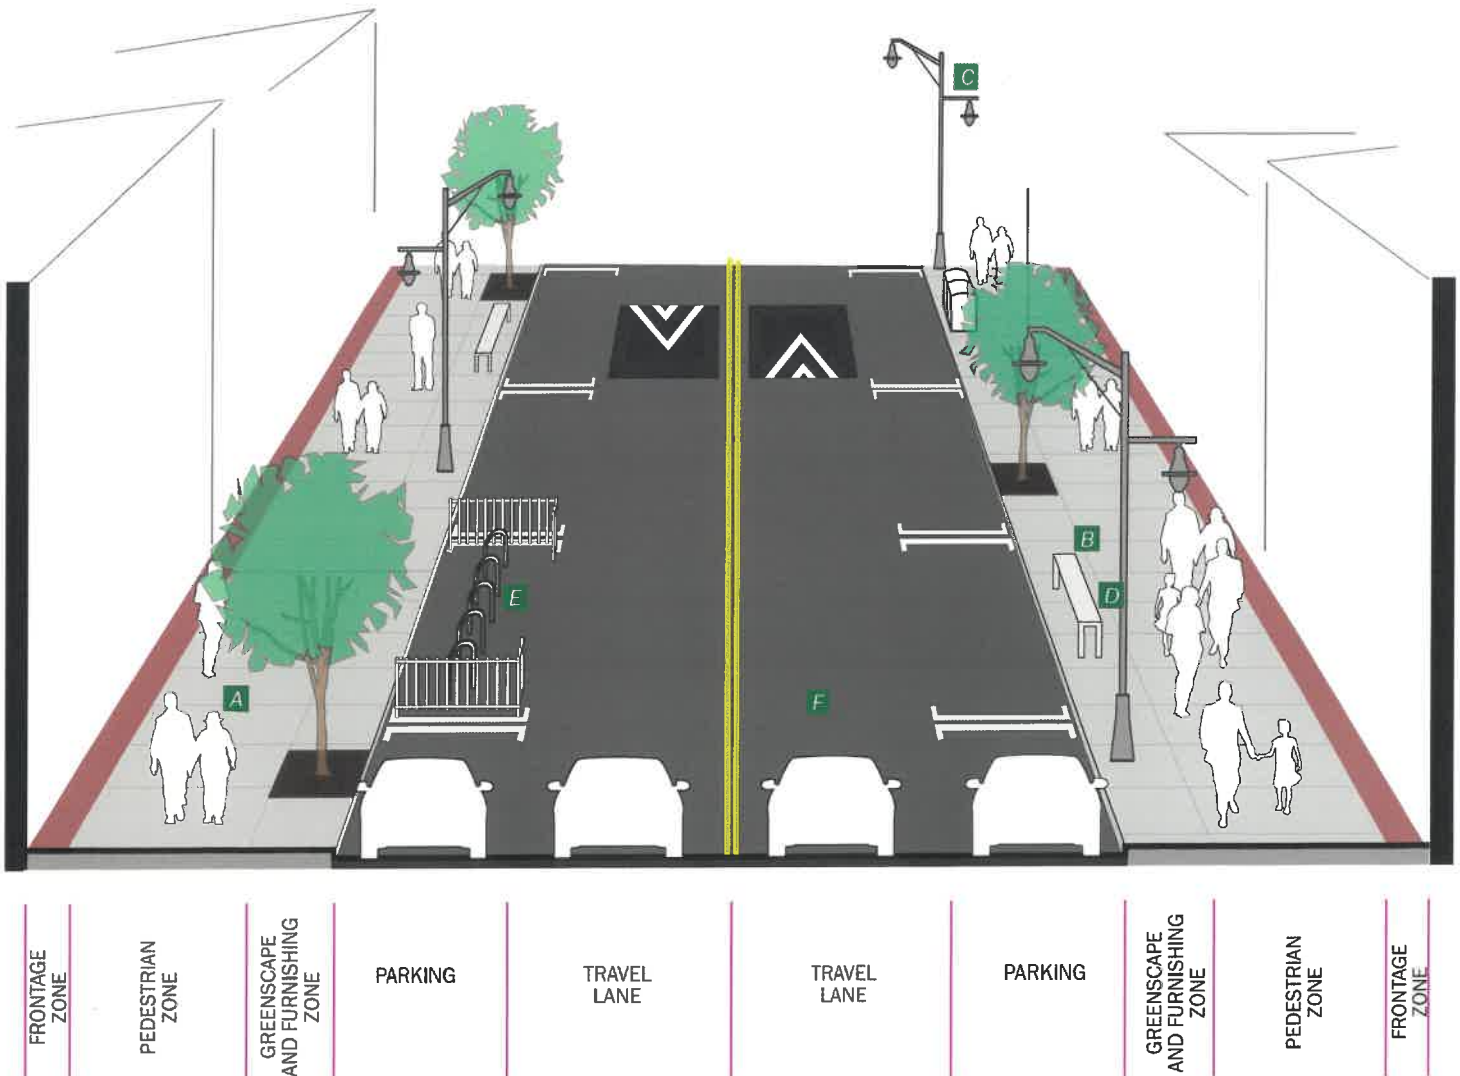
Model cross-section of a Neighborhood Mixed Use street
